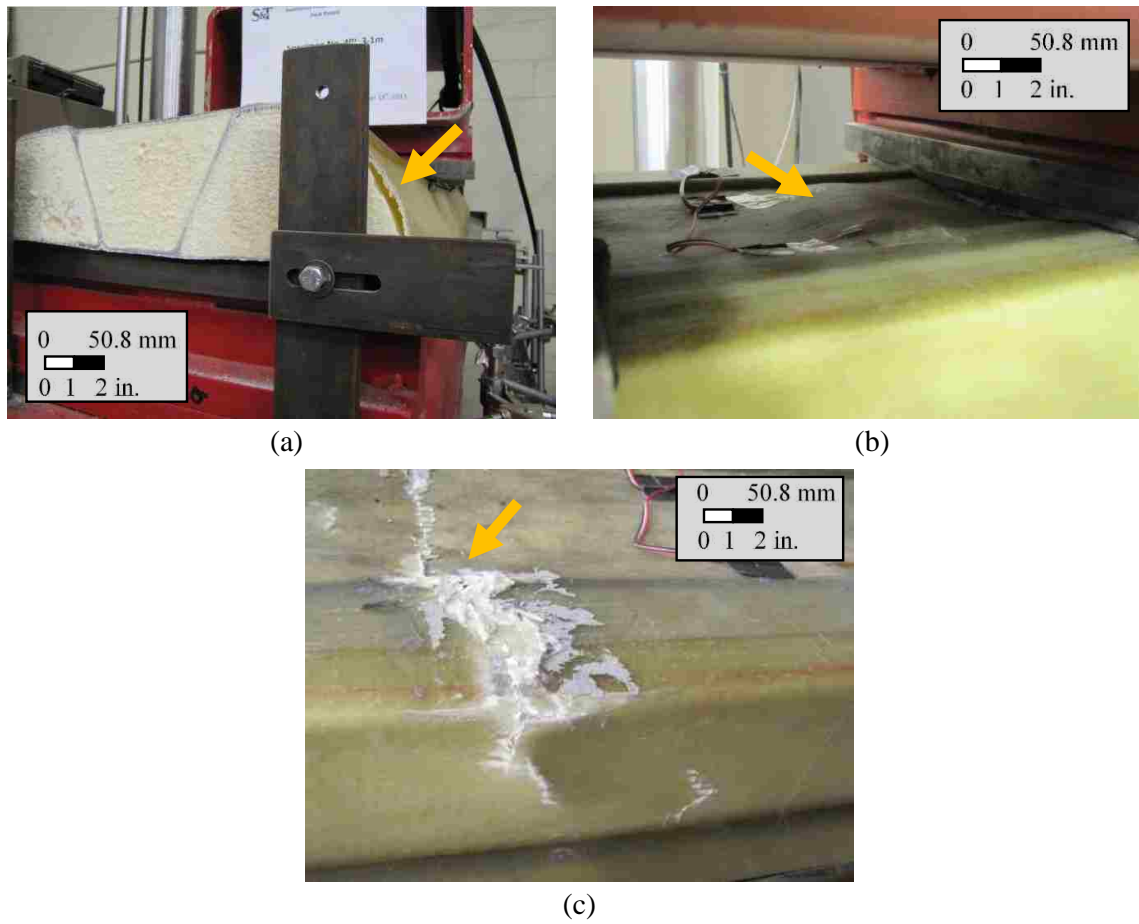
Failure modes: (a) delamination, (b) outward facing wrinkling, and (c) compression failure
